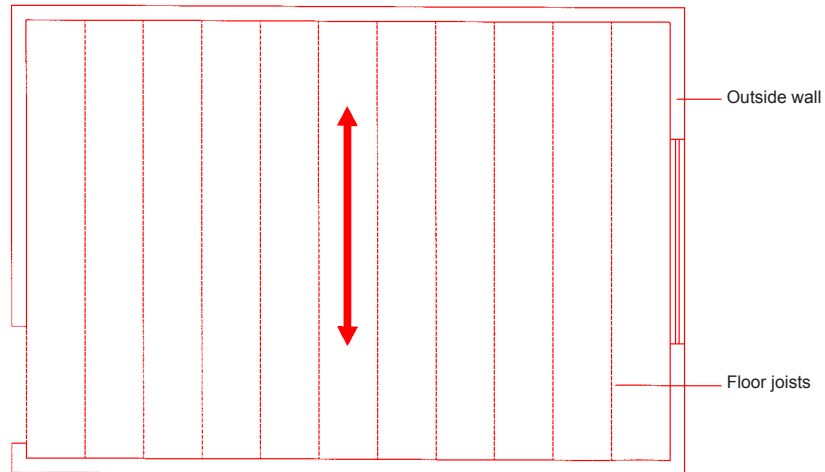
For carpeted floors, install Quik Trak panels parallel to the exterior wall to allow the warmest water to reach the coldest area first.
